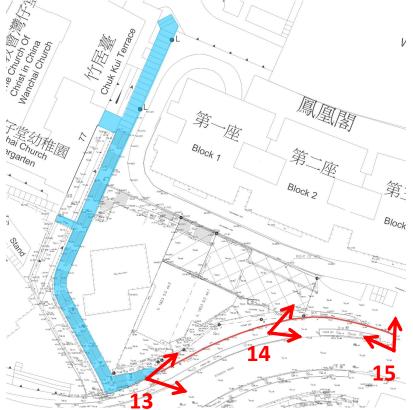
EXISTING SITE CONDITIONS (Spring Garden Lane Staircase)
